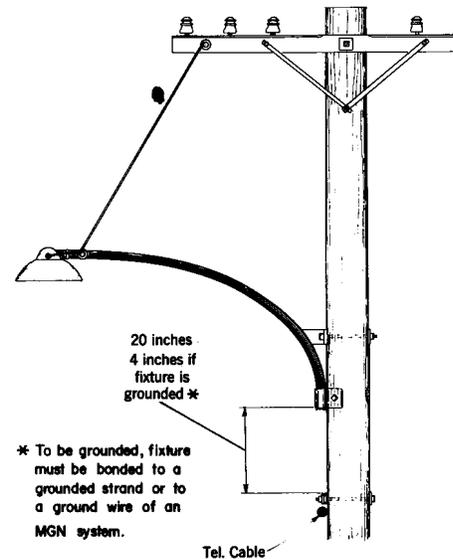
Clearance of Cable From Streetlight Fixture Mounted Above Cable
